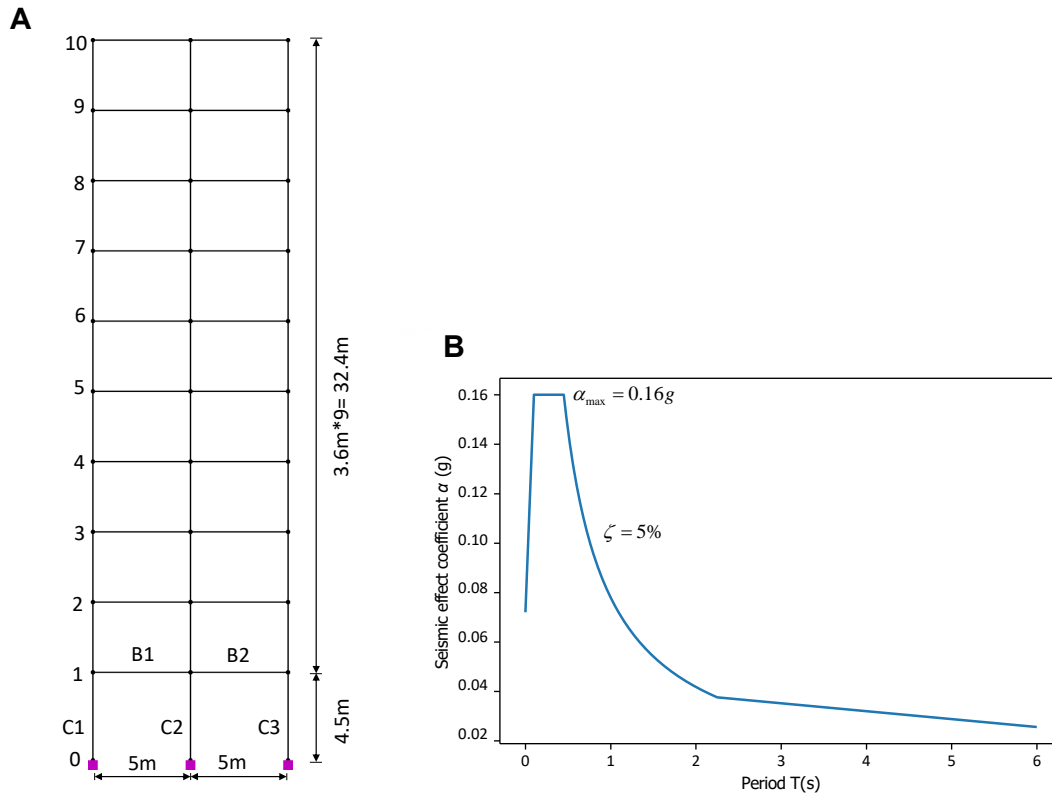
Structural layout and design spectrum. A: Ten-story two-bay planar concrete frame; B: Design spectrum ($\zeta = 5\%$)
